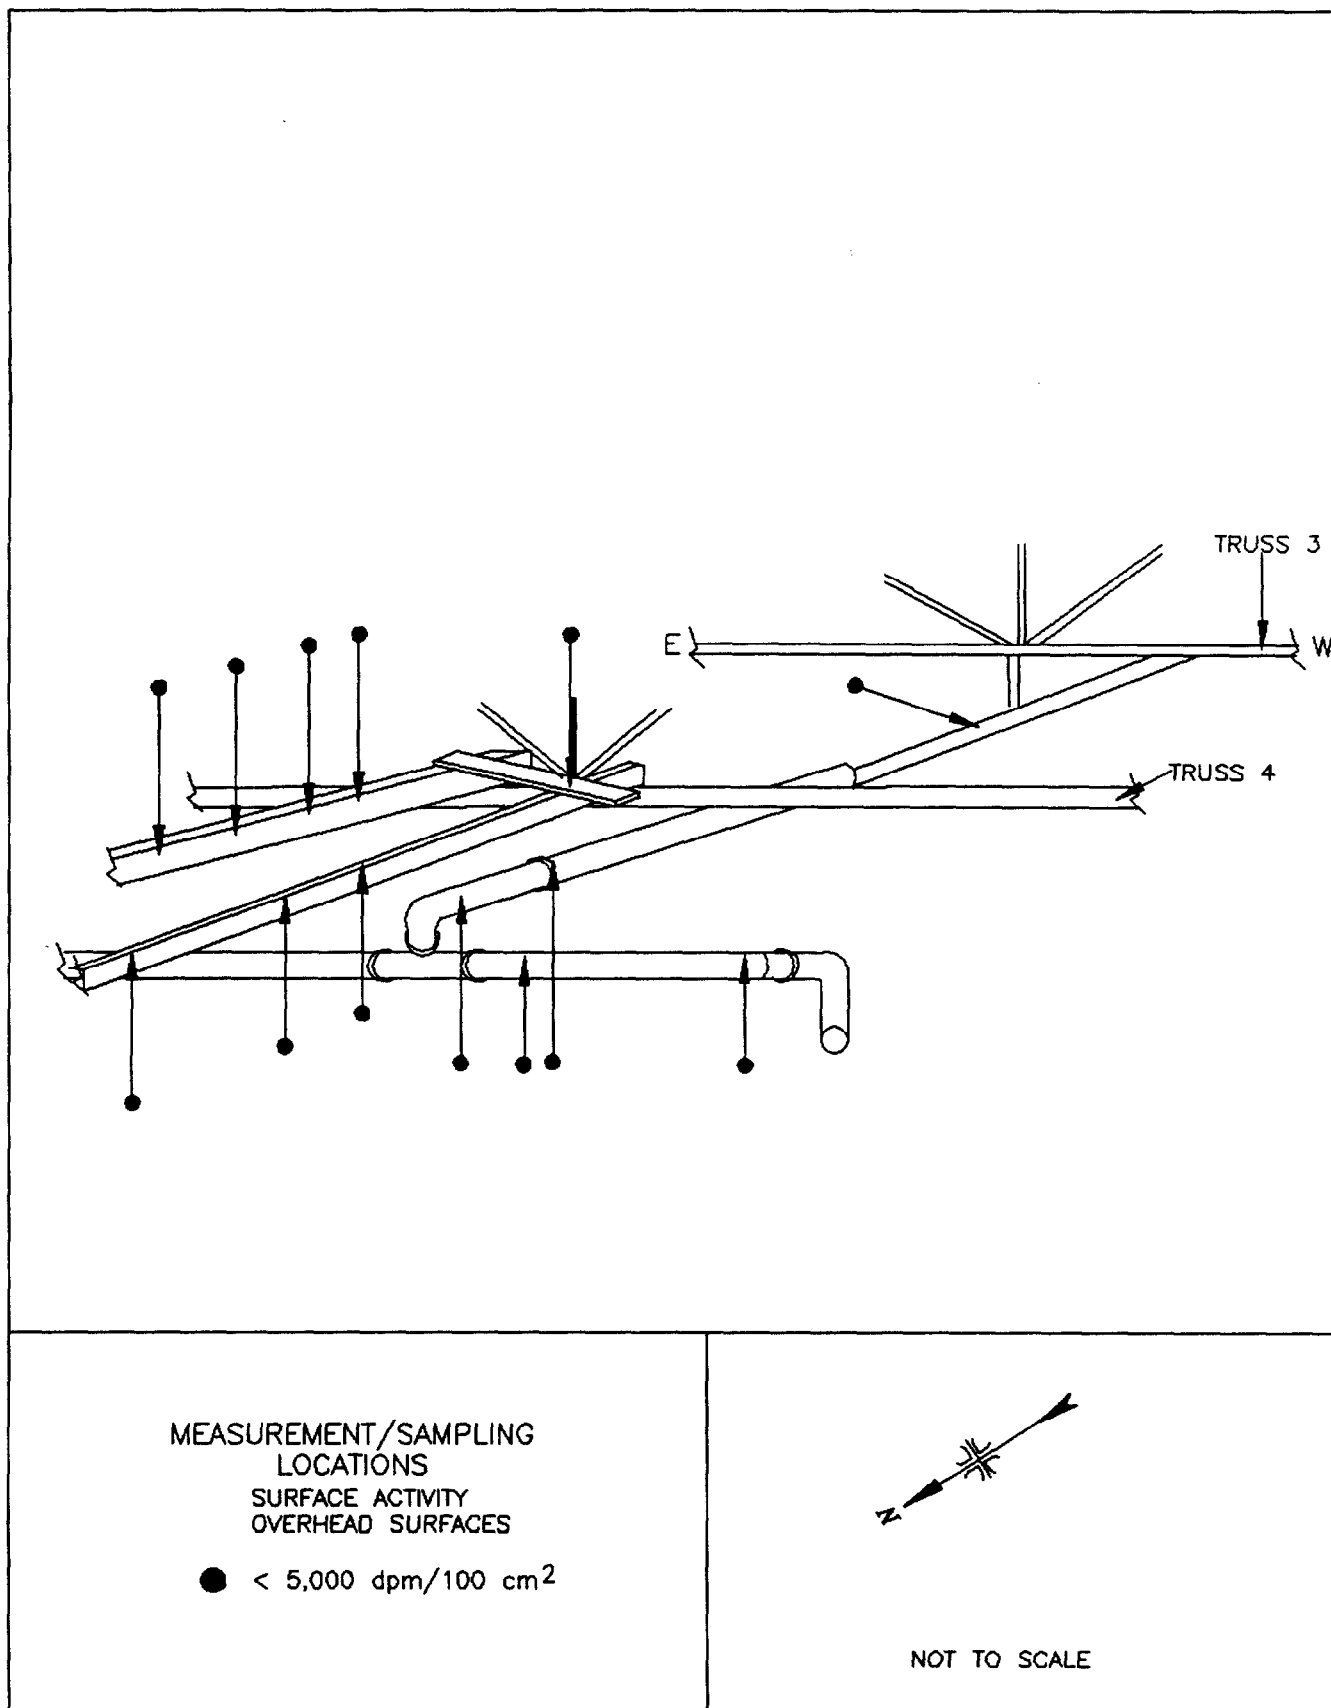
Building 8, Overheads, Bay 4 – Measurement and Sampling Locations
